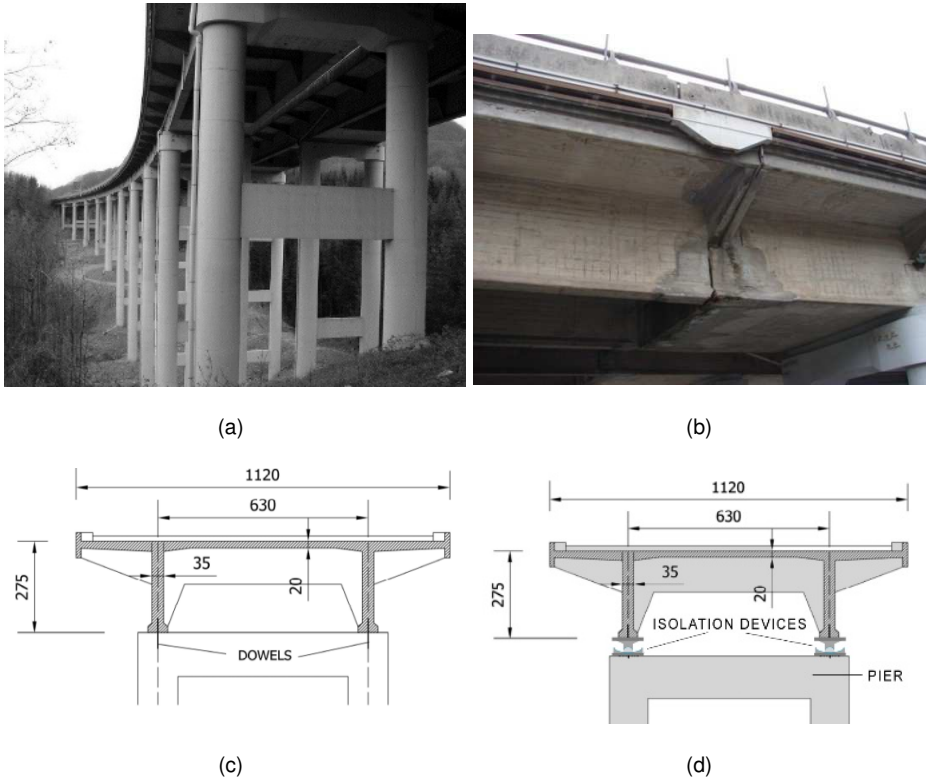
Structural details of Case Study I: a) View of the frame piers; b) View of the Gerber Saddles; c) Cross section of the *as built* bridge; d) Cross section of the isolated bridge.
